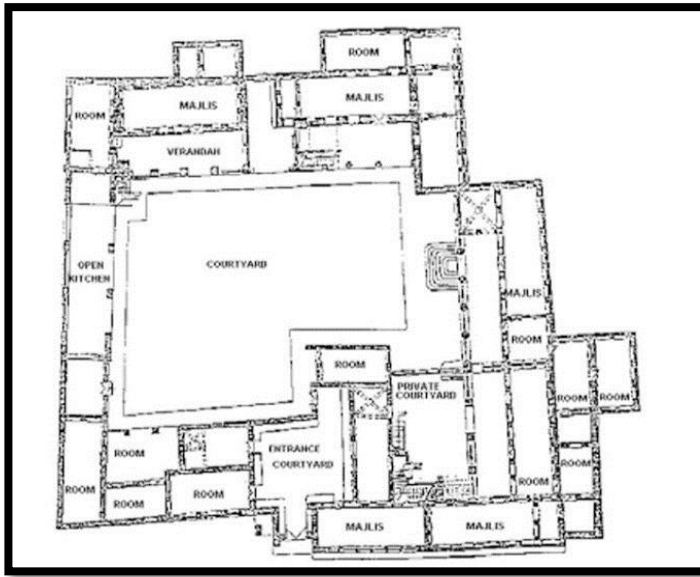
Plan of a traditional courtyard house (Haddad, 2010, p.44)
